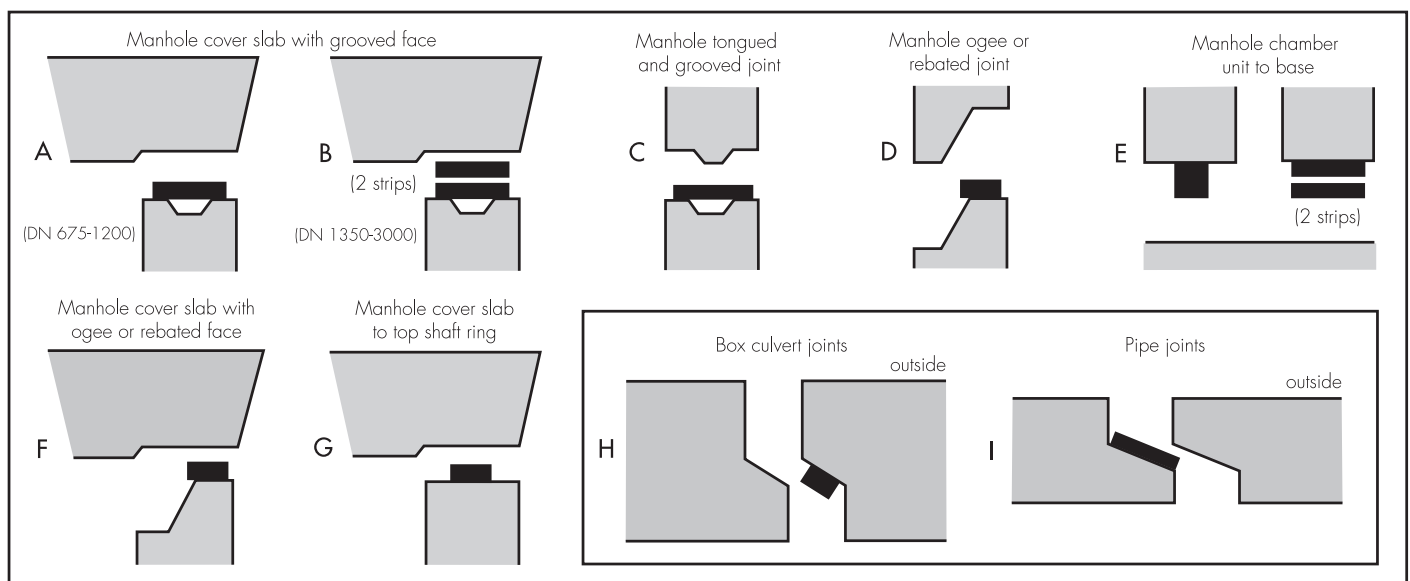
Correct Premstrip position shown in cross section for sealing manhole, box culvert and pipe joints.
